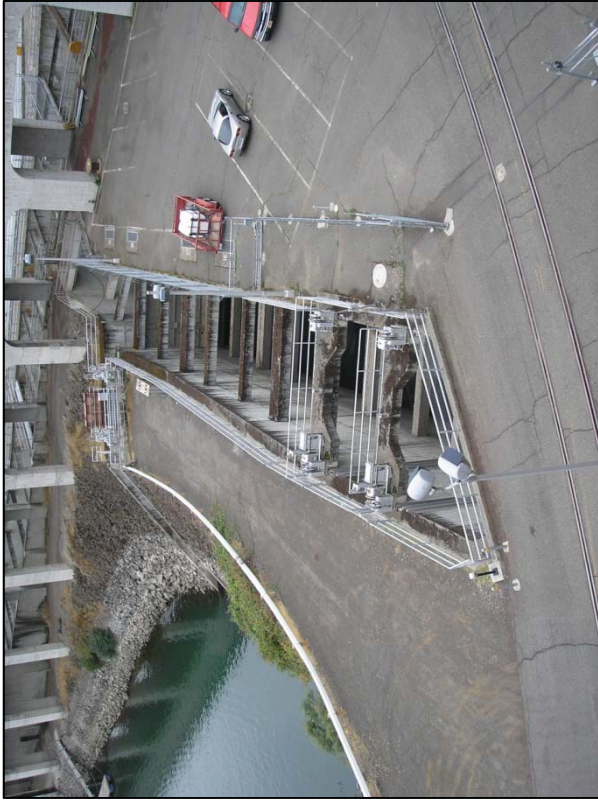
Looking upstream at East Ladder, note location to the left side of photo.
